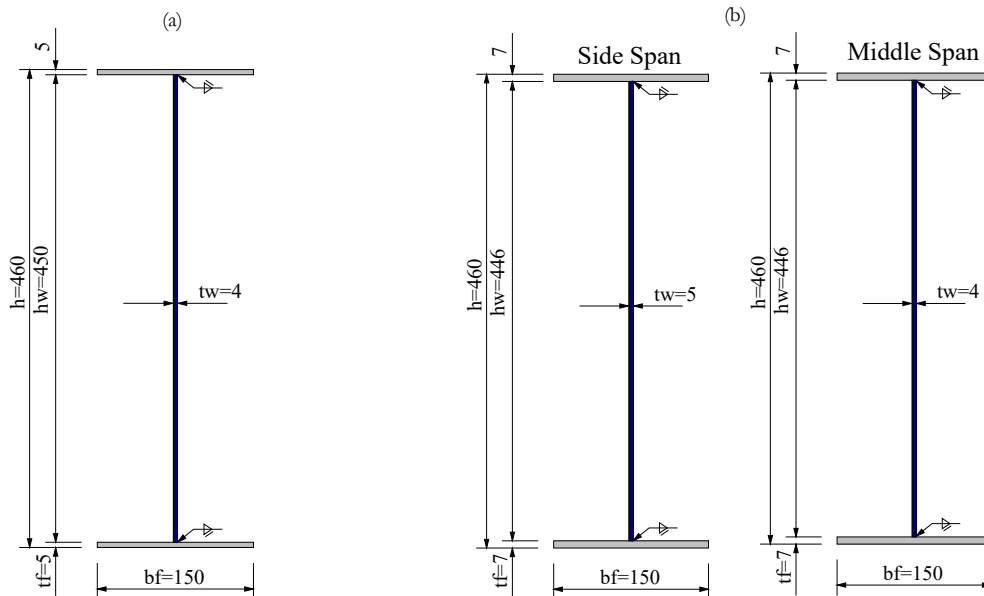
Dimensions of welded I-sections, in mm. (a) Test-1. (b) Test-3 [23]
